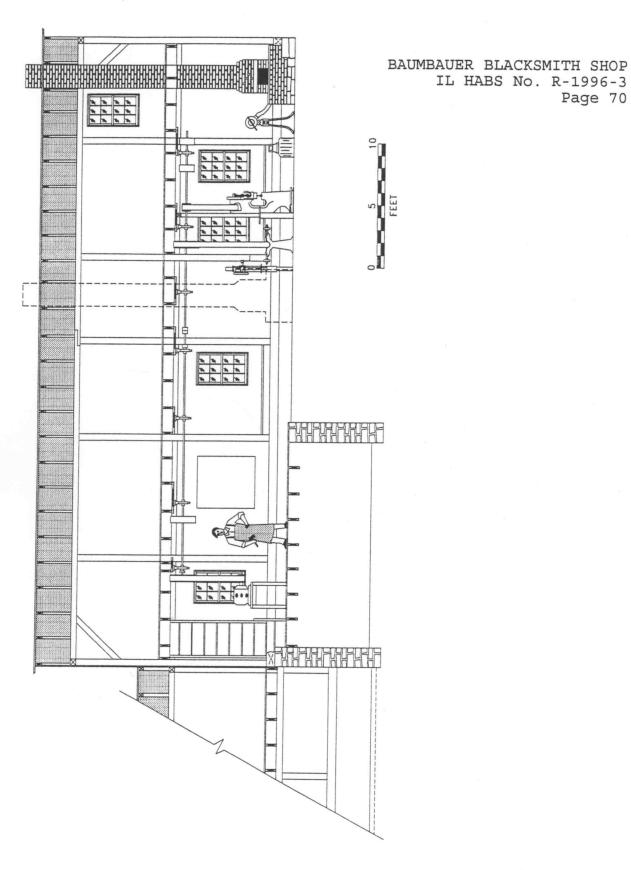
Longitudinal section of the Baumbauer Blacksmith Shop.
